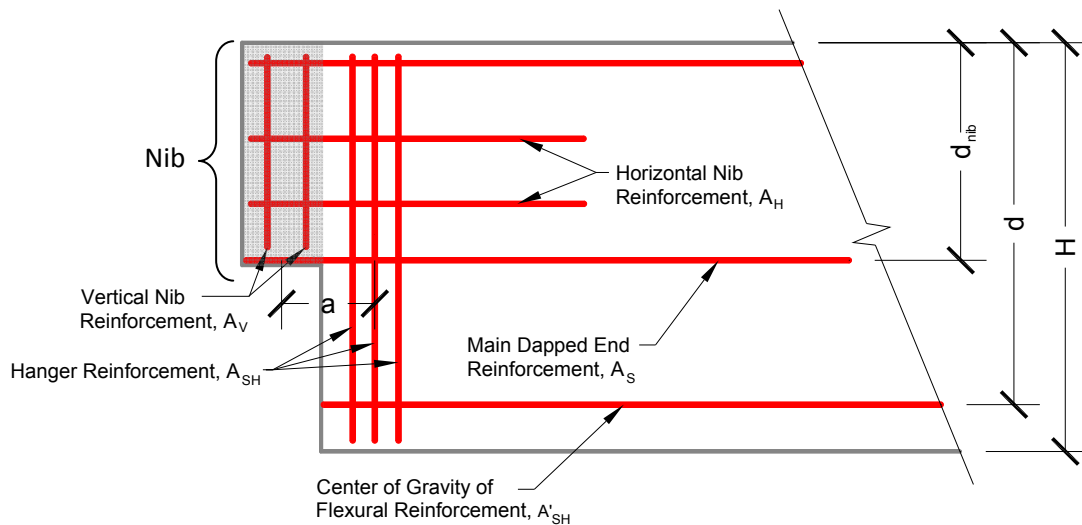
Dapped end general terminology with *PCI Design Handbook* labeling (drawn from Precast/Prestressed Concrete Institute, 2004).
